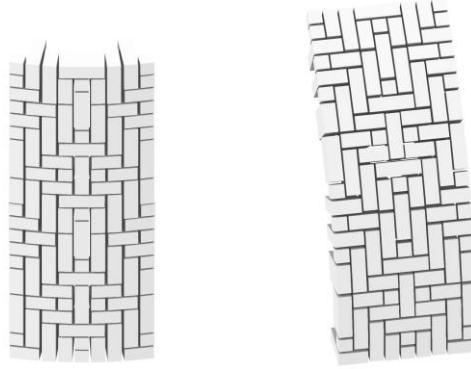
Directions of bricklaying in single-curved surfaces: brick rows parallel to the ground, brick rows are rotating around the center.
